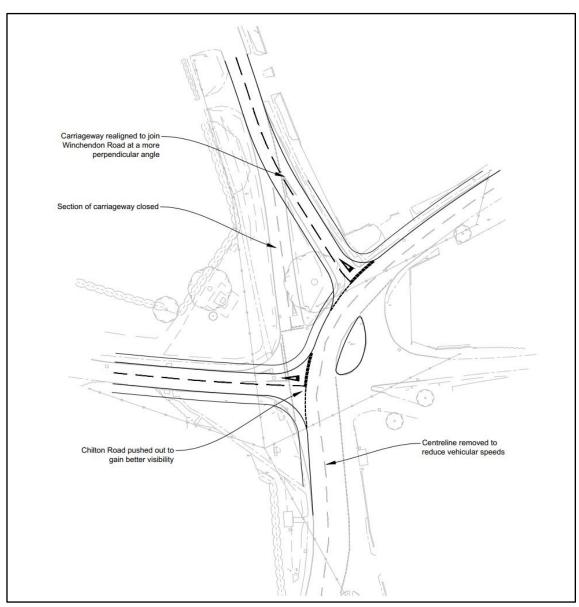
BWB Option 12 (Realignment of junction - Layout B)
